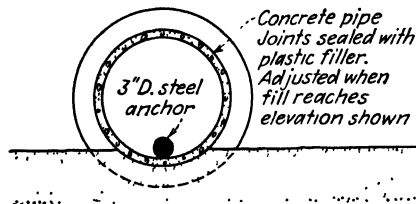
Possible way of protecting anchors against overloading by later settlements of fill.
